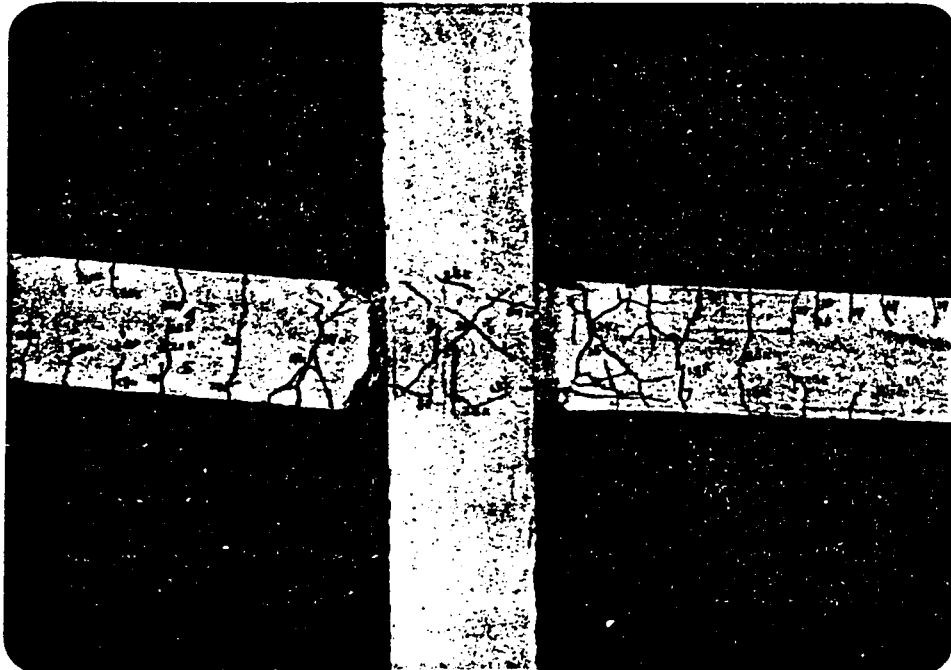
SPECIMEN 1 WHEN TEST WAS TERMINATED
